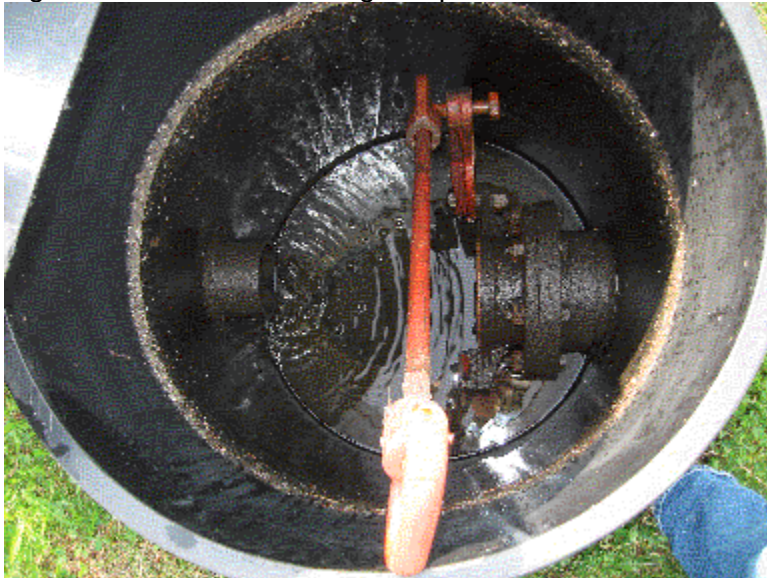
Flow Monitoring setup for Surface Water Runoff from Pervious Pavement Sites
